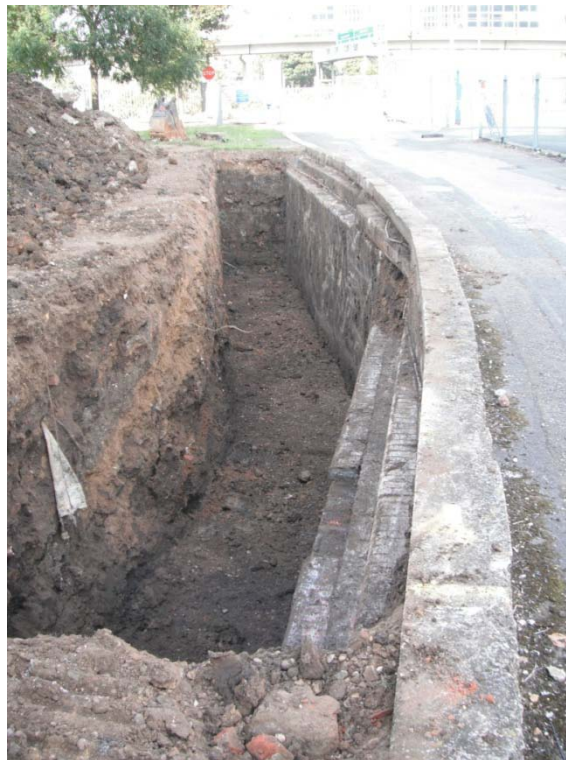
Extended dock wall [1] in Trench 2, view southeast
